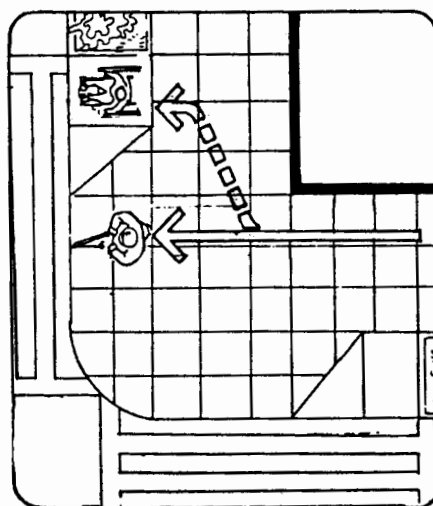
Recommended installation of curb ramp out of the direct line of pedestrian travel.
